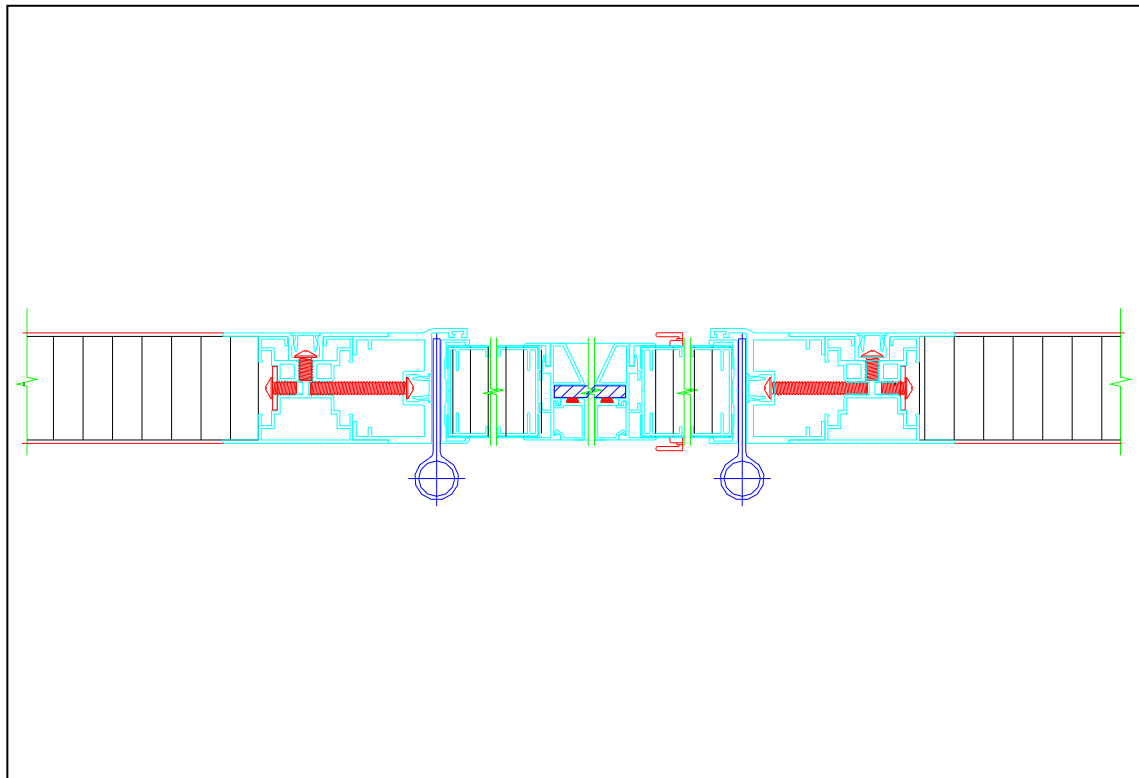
SFS2000 System 4.6m Height Continuous Window Wall
